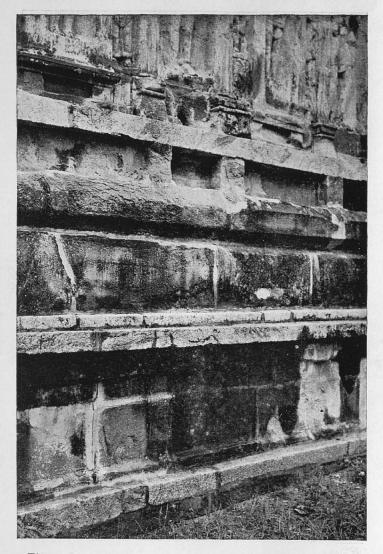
Location of Nāla opening, Muktēśvara Temple Wall, Kāñchipuram
